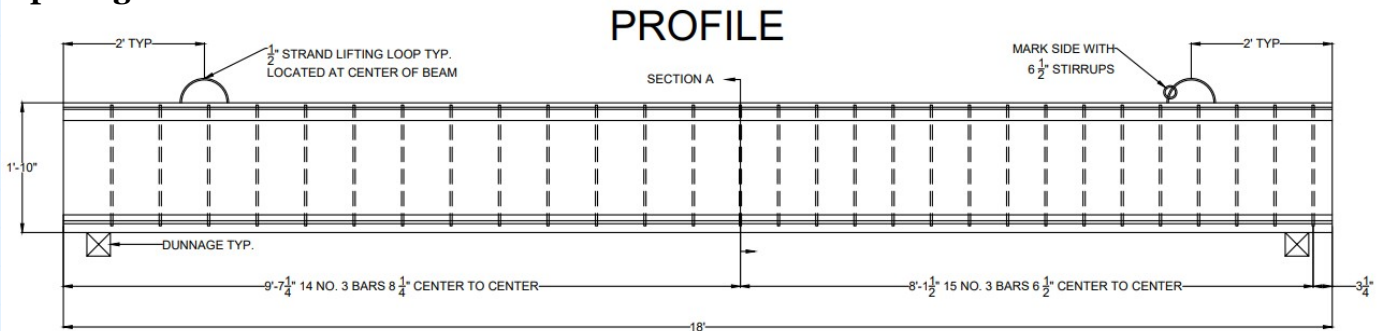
Stirrup Pattern Outlined in Shop Drawings
